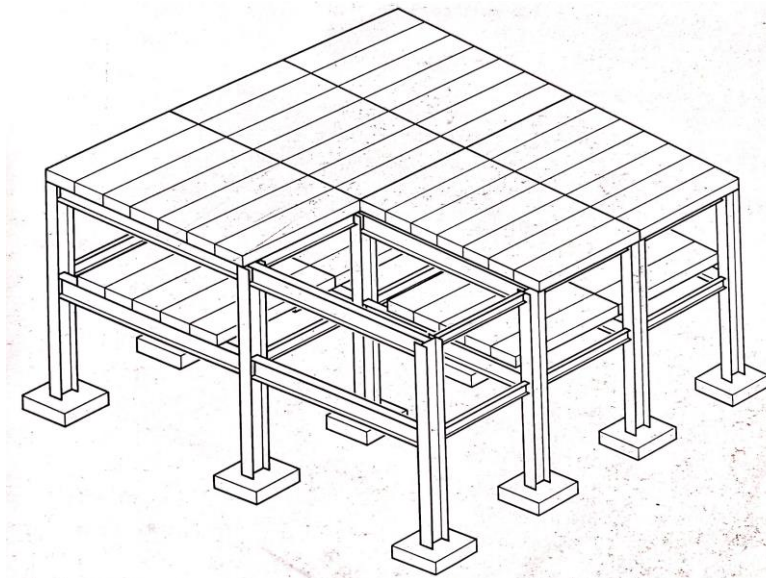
Structural figure shows columns, beams, roofs and floors arrangements (MacDonald, 2001)
